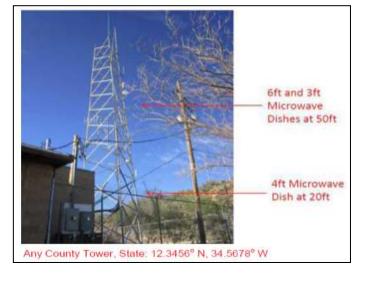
Ground-level photograph showing proposed locations of new communications equipment on an existing tower.
